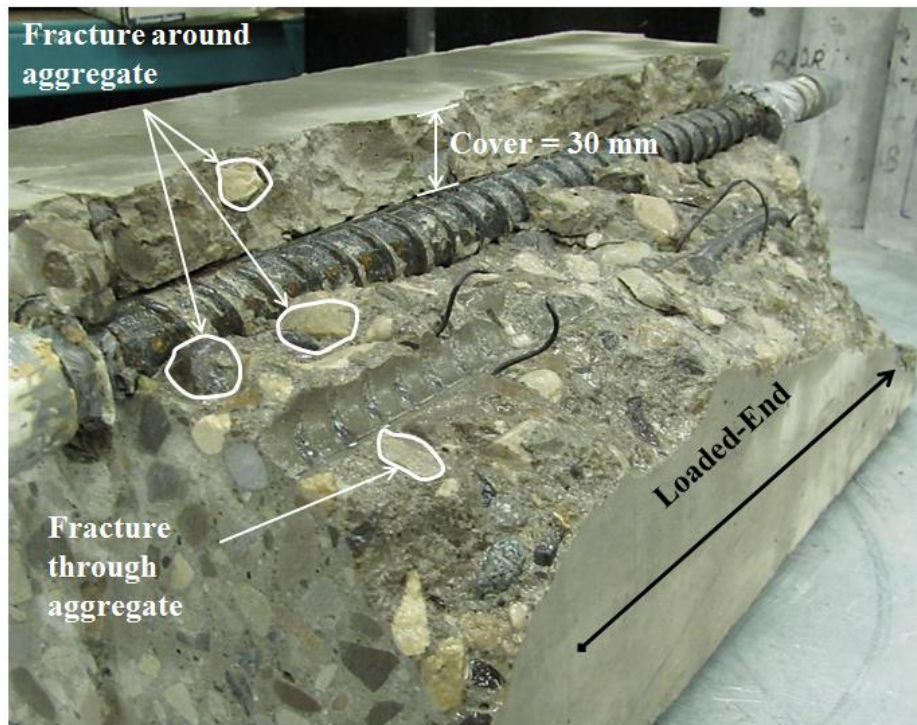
Main failure planes through concrete cover (dissected BE-NAC-40-450A)
